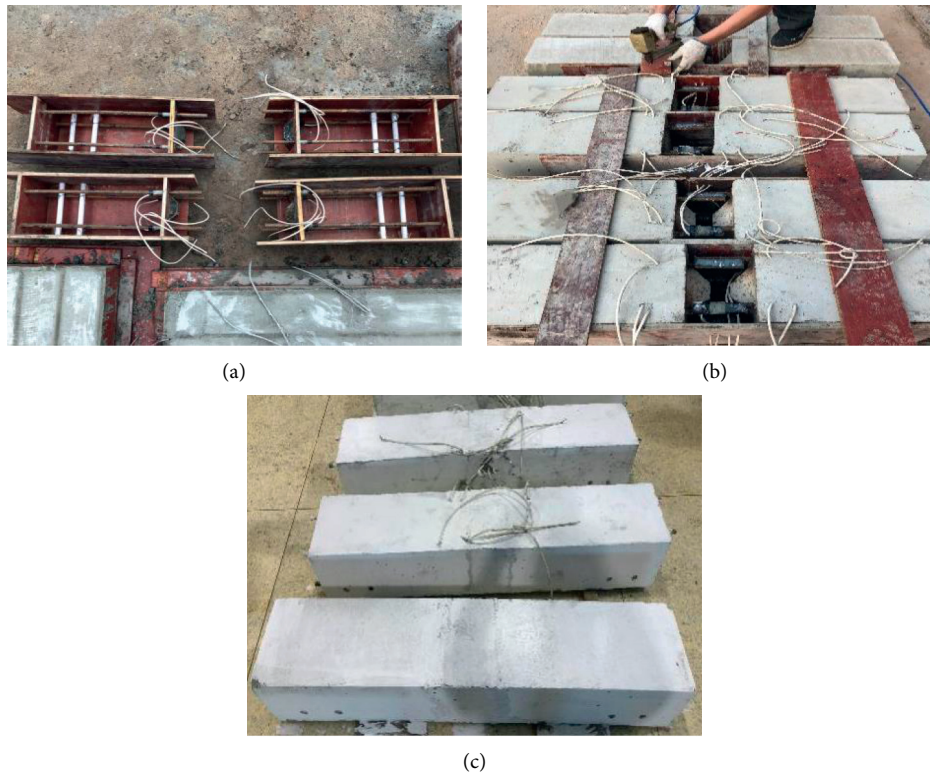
Fabrication of experiment specimens. (a) Formworks of the specimens. (b) Panel-to-panel alignment. (c) Experiment specimens.
